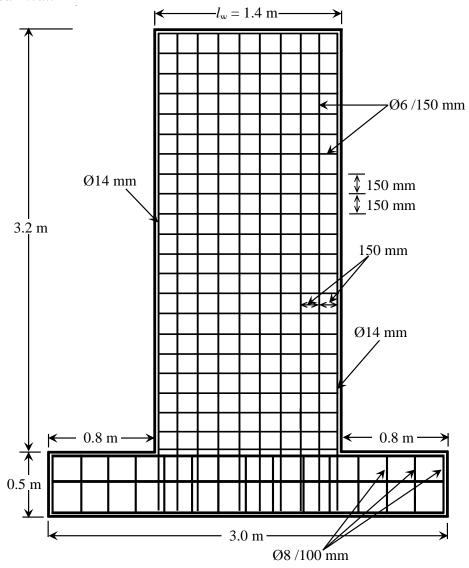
Plan View of the Test Specimen (SW) and the Foundation
